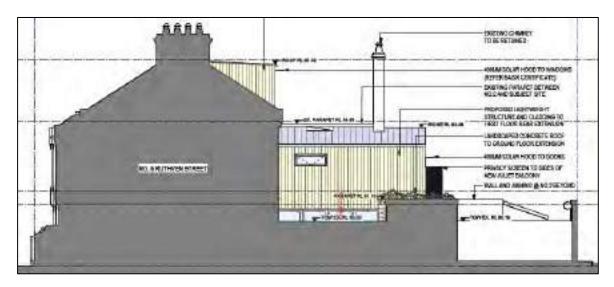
Southern elevation demonstrating the windows will not reduce visual privacy to no. 6 Ruthven Street (*Source: Ergo Architecture and interiors, 2021*)
